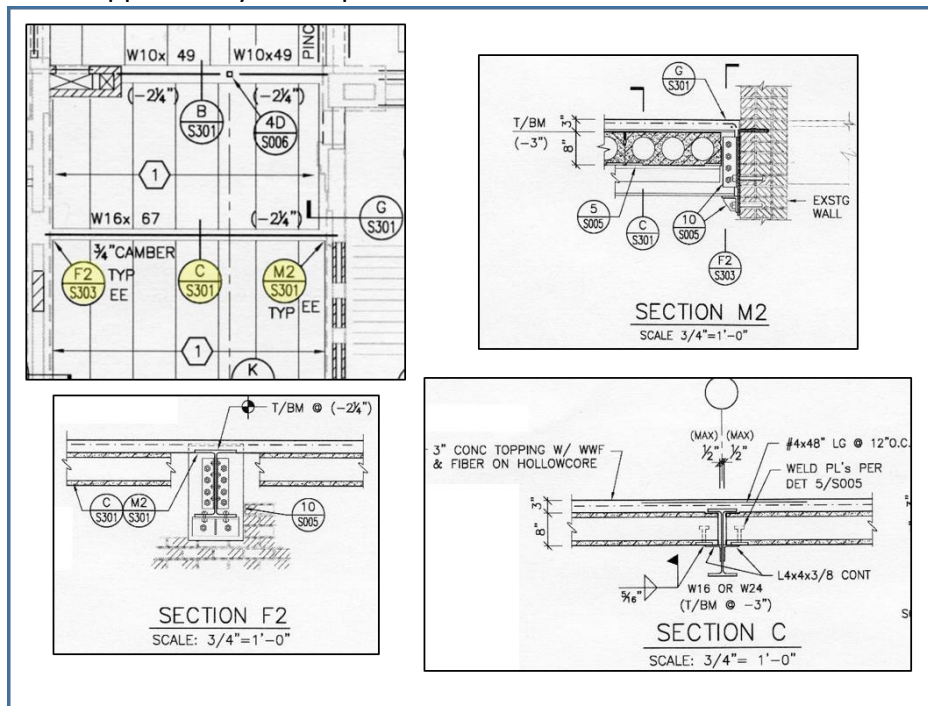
Details of the original floor system design – precast hollow core planks w/ 3" concrete topping. (not to scale) (Hardlines Design Company)
